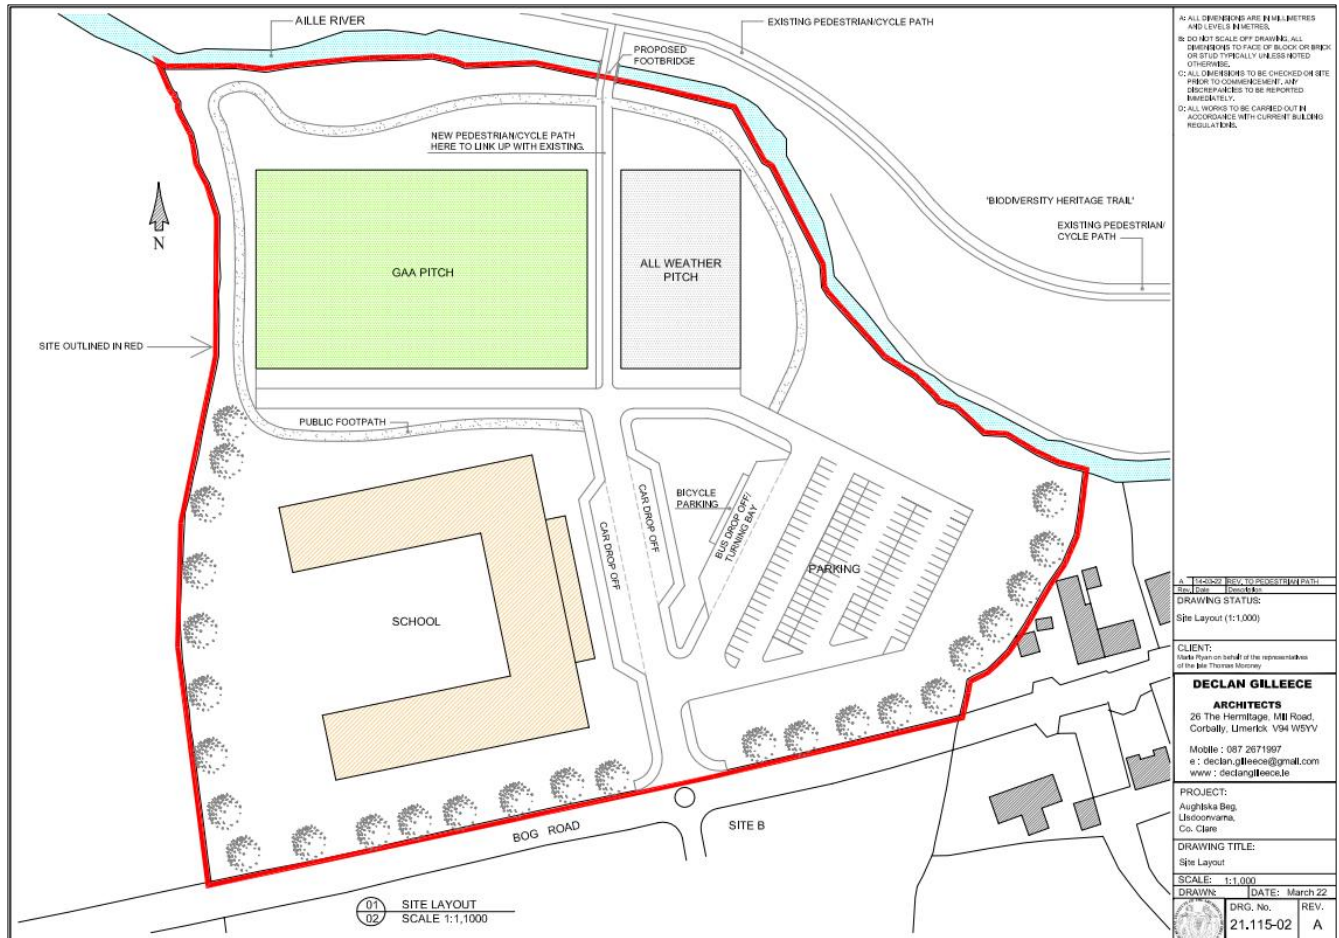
Proposed Layout for Site 'A' (See Appendix A for larger plan)
